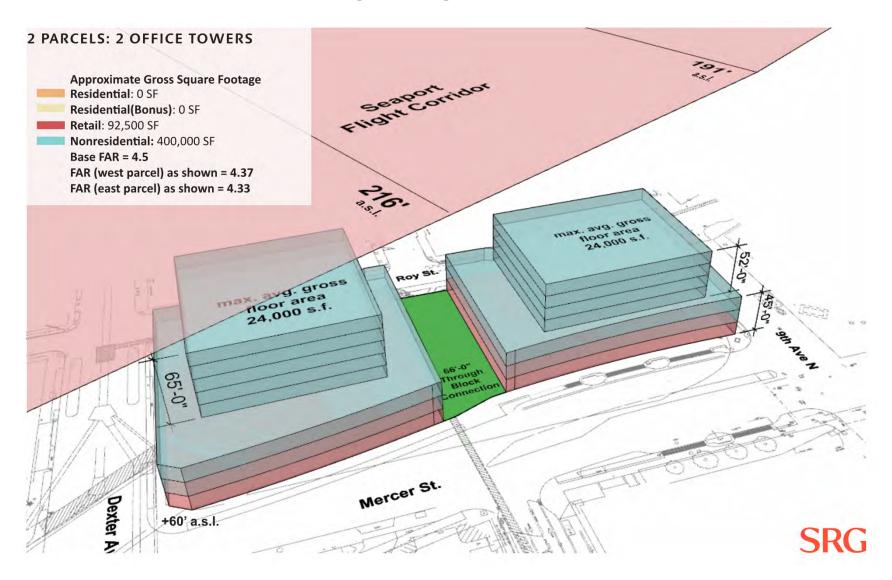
Potential Building Envelope With Existing Zoning (Office)
